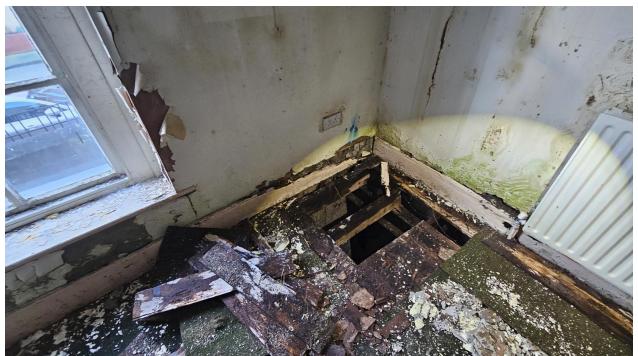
Internal floor of extension (First floor – front). Close up of hole in floor
